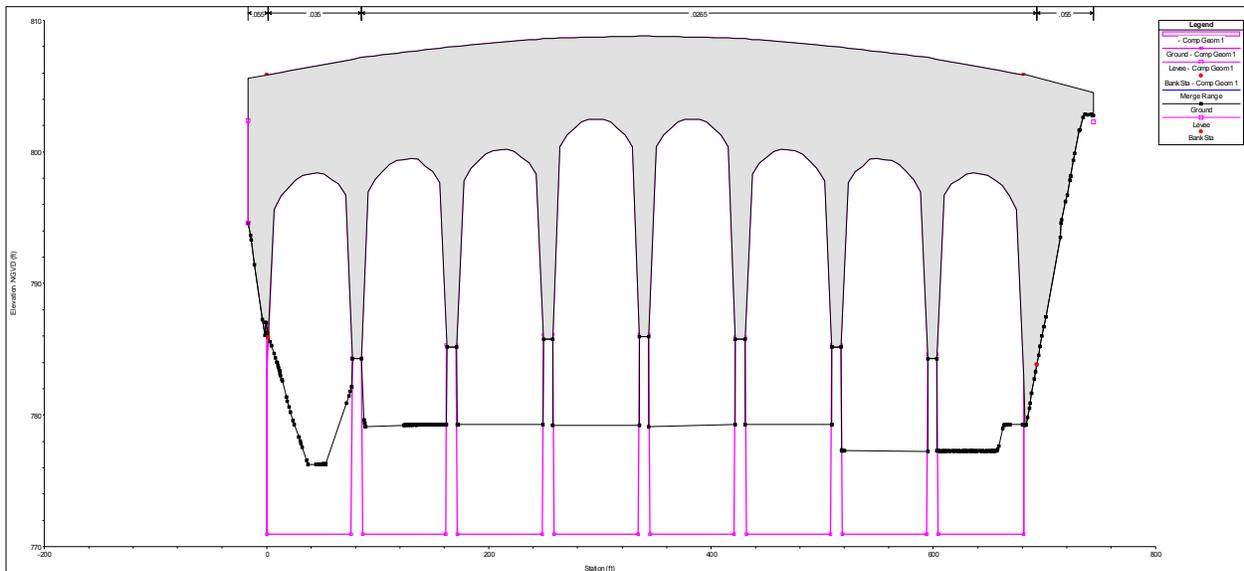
Model Cross-Section Comparison at Scott Avenue Bridge (Black - Proposed, Pink - Existing)
